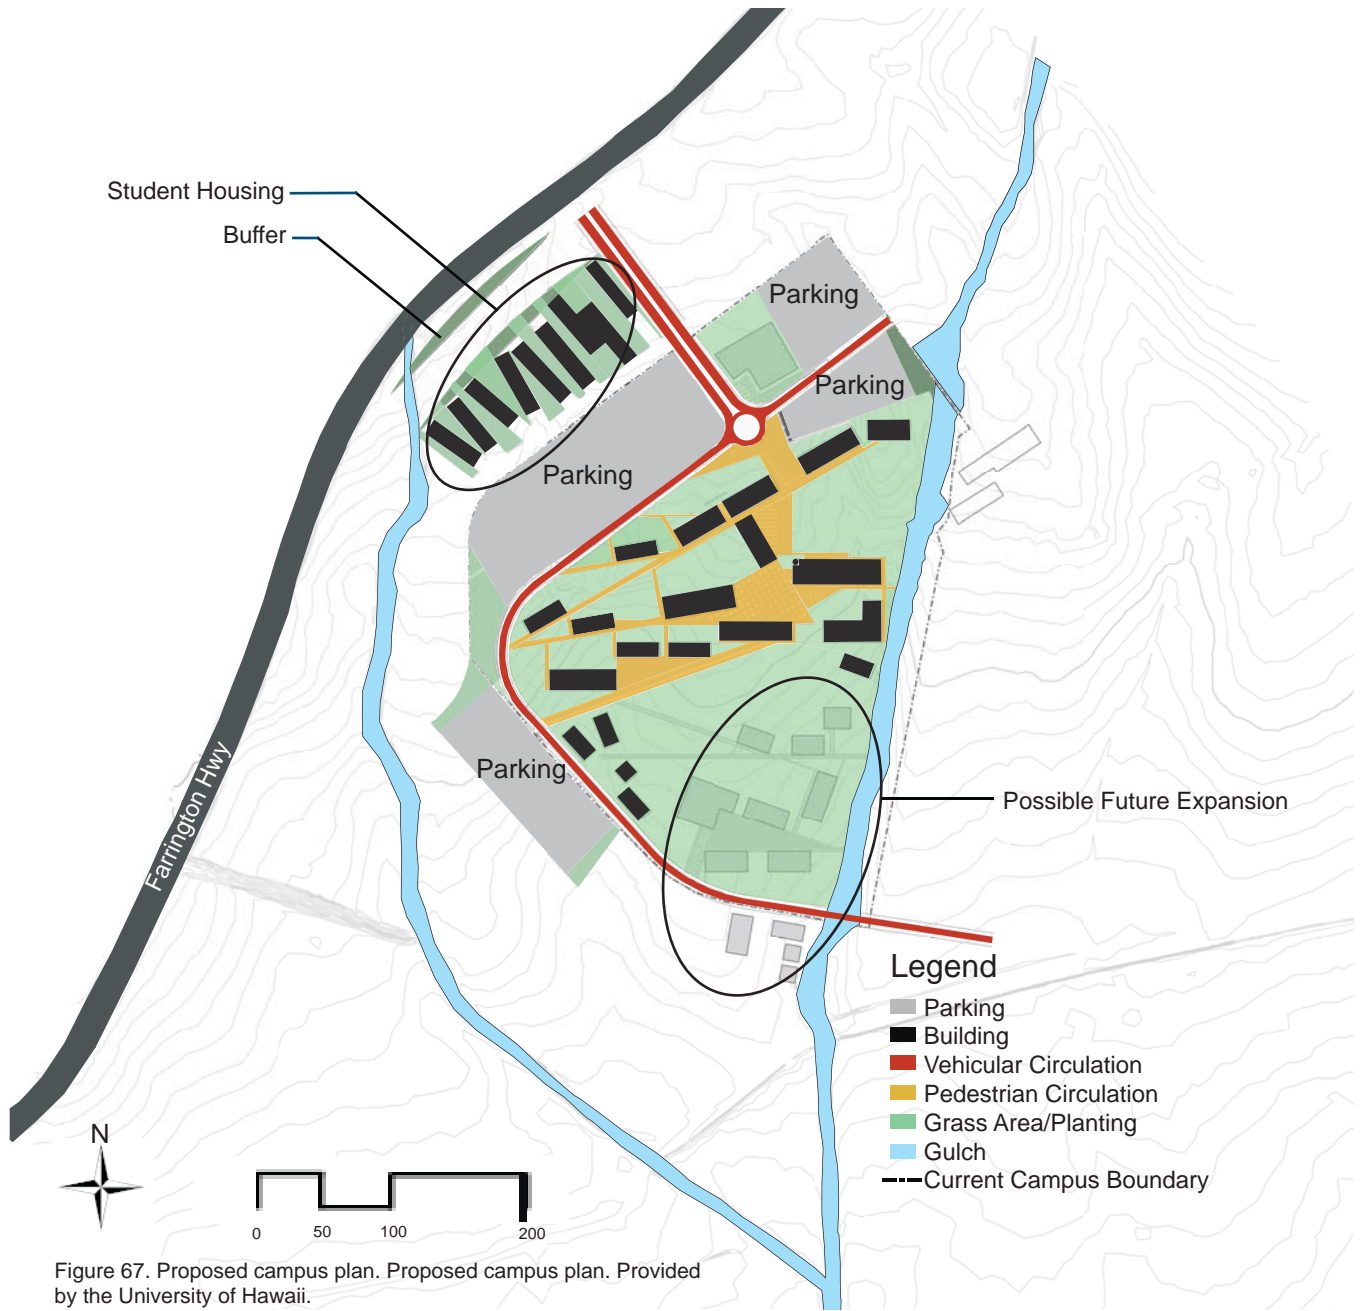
Proposed campus plan. Proposed campus plan. Provided by the University of Hawaii.
